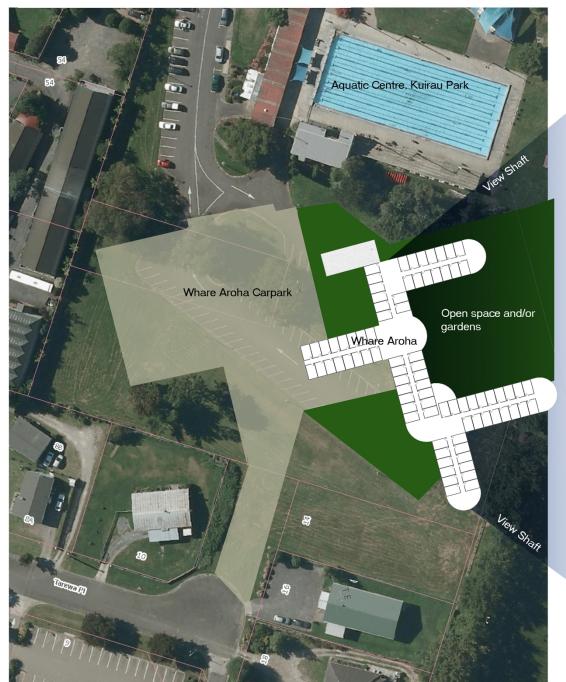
A conceptual location plan of how the facility could fit in the area. Note: This building design for Whare Aroha is based off a facility designed for another site. This has been used solely to illustrate how the scale of the facility would fit on the area.
